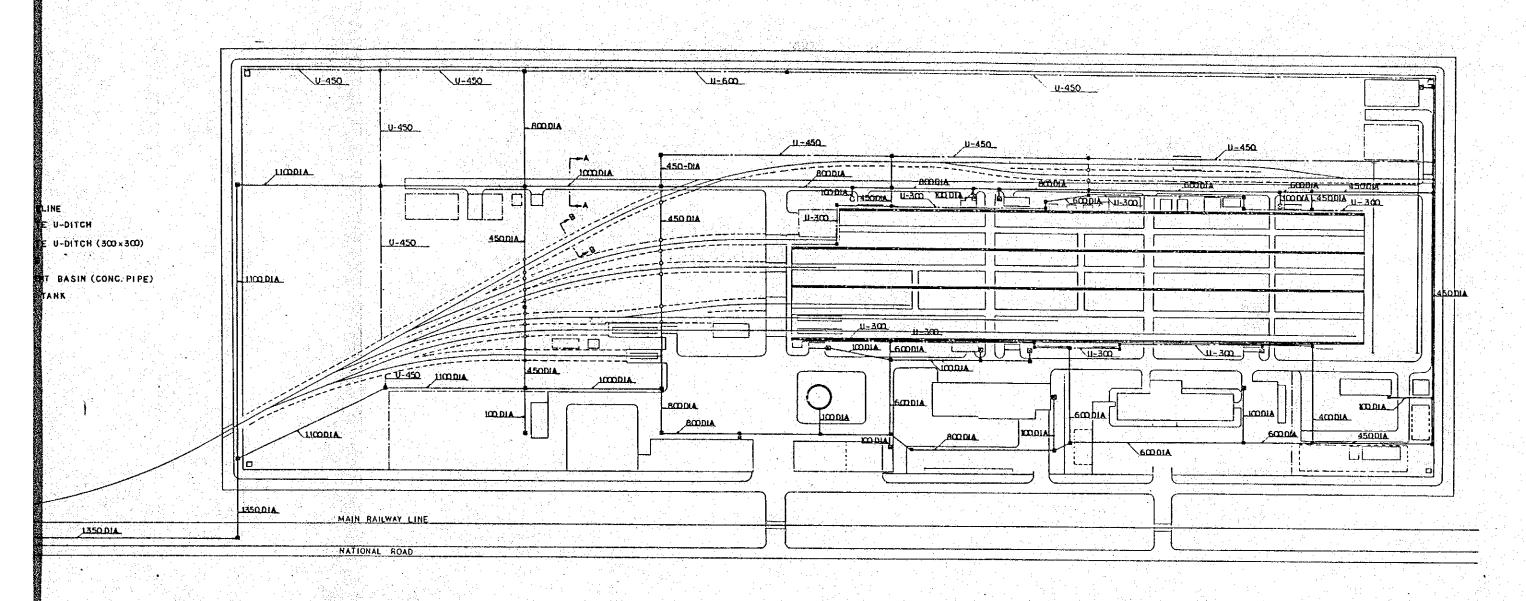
PIPE ALLOCATION OF DRAINAGE SCALE-1:1000
